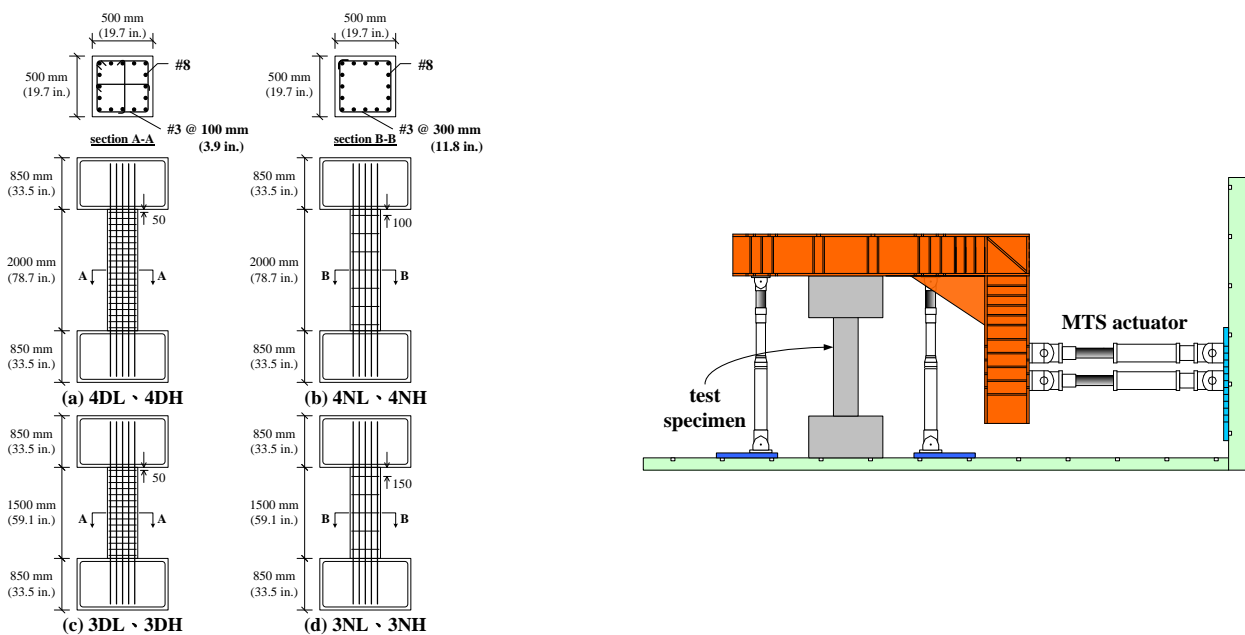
Specimen elevation and sectional detailing Figure 2: Test setup
